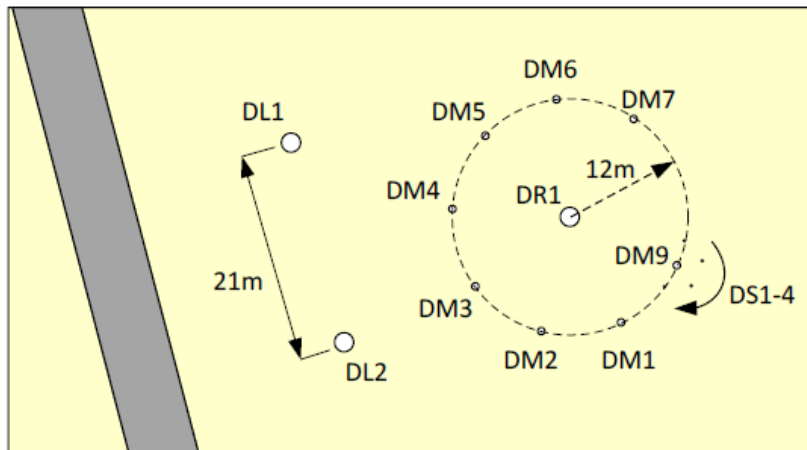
Dunkirk site layout(taken from PISA field report)
